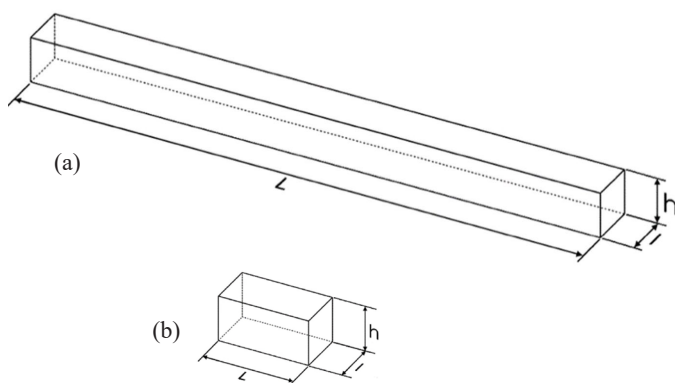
Shape of test specimens: (a) Flexural/tensile specimen; (b) Compression specimen
